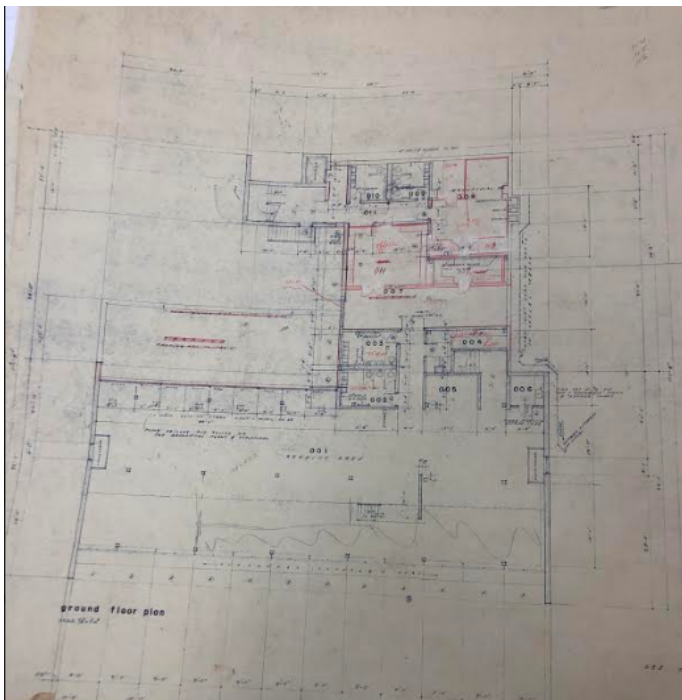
The 1979 plans to remodel the Storch first floor (Office of University Architect 1979).
